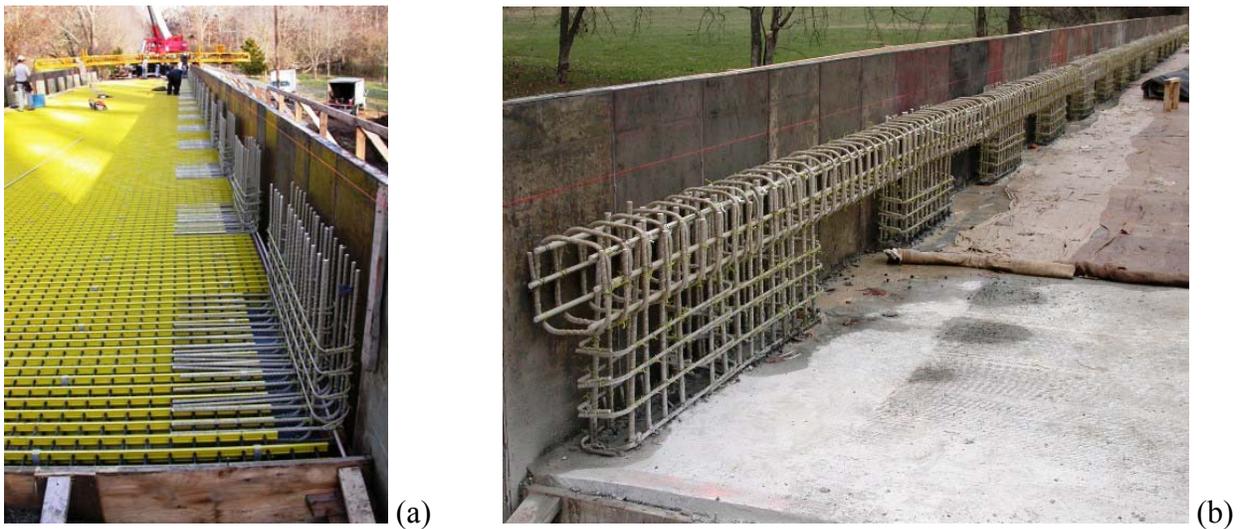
Open-post railing construction: Mounting of post cages in panel cut-out pockets (a) and of beam cages upon casting of deck (b).
